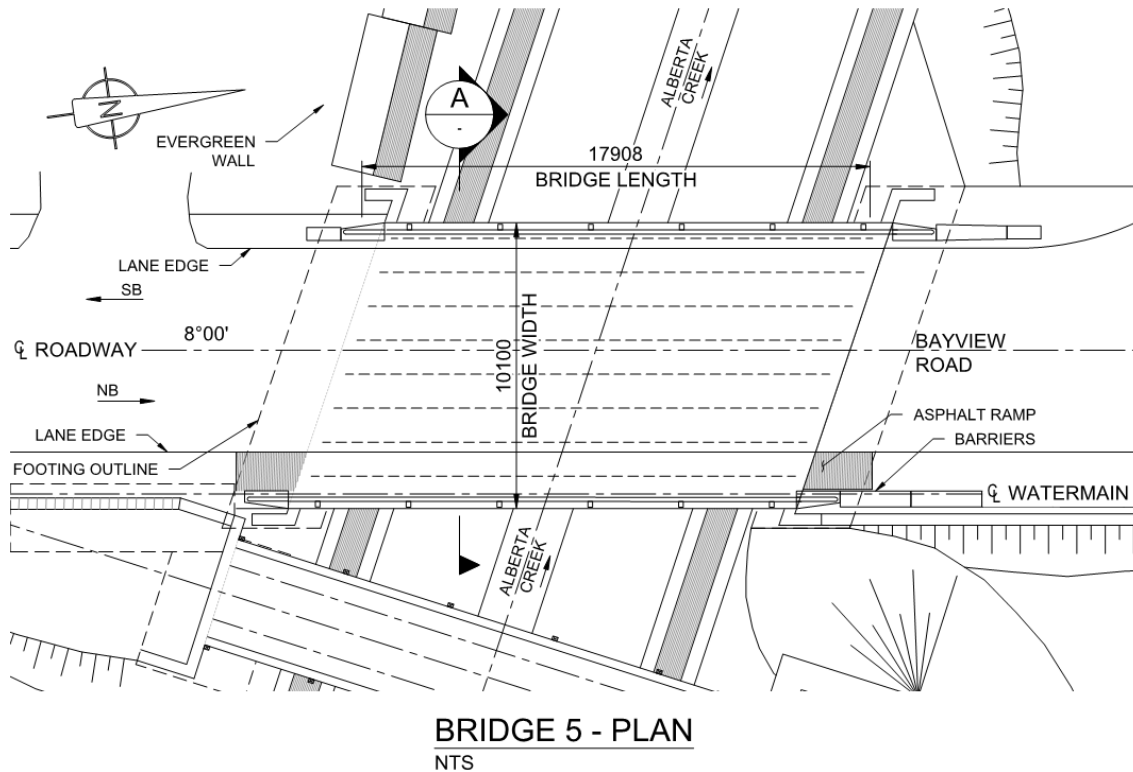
Bayview Road Bridge over Alberta Creek – Plan
